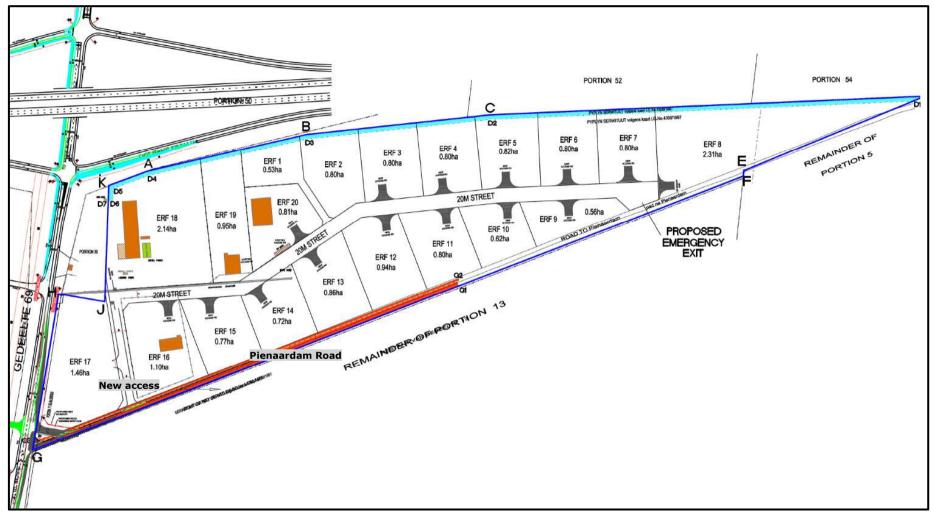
Alternative layout 3 (new access road from Pienaardam Road)
